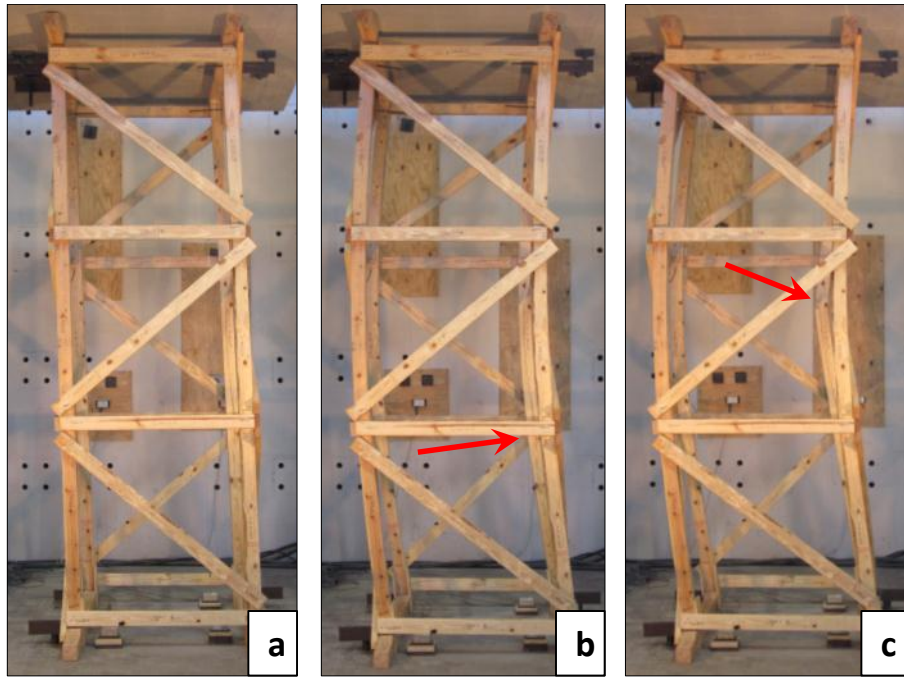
Test 6 loading stages (a) Initial 6 inch displacement prior to loading (b) First joint failure (c) Back-right post failure
